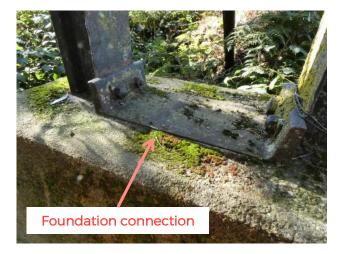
Steel tower to concrete foundation connection - eastern tower
